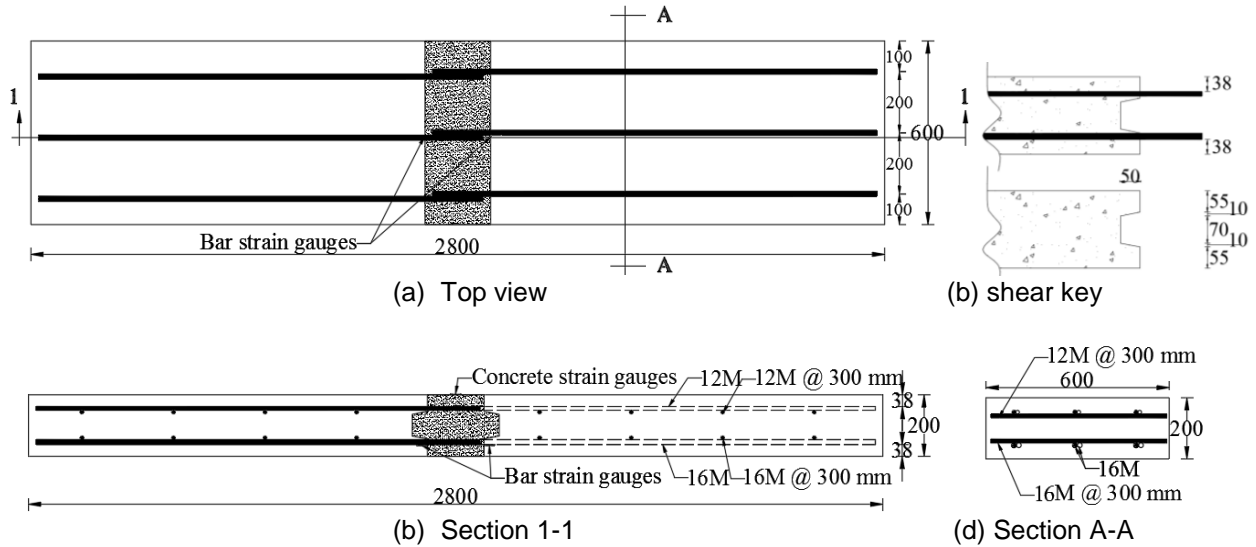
Typical dimensions, joint configuration and GFRP bar arrangement for the slabs
